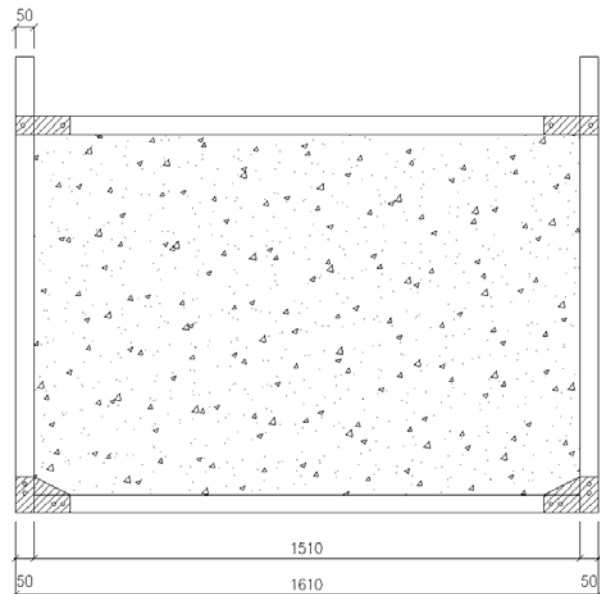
Design to strengthen damaged structural components with plate stiffeners
